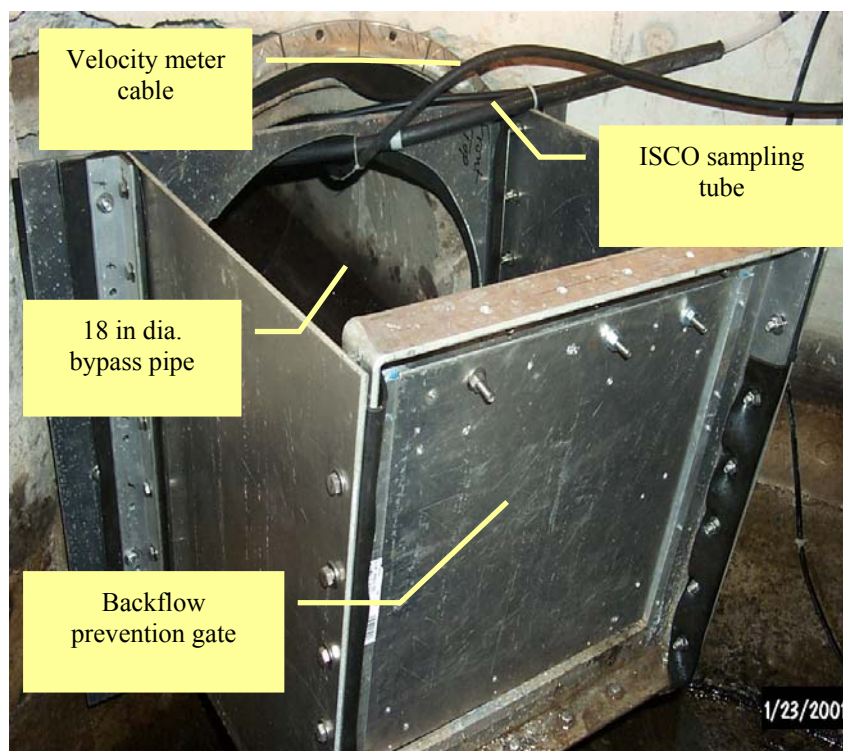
View of Monitoring Site 3 (bypass and backflow prevention gate).
